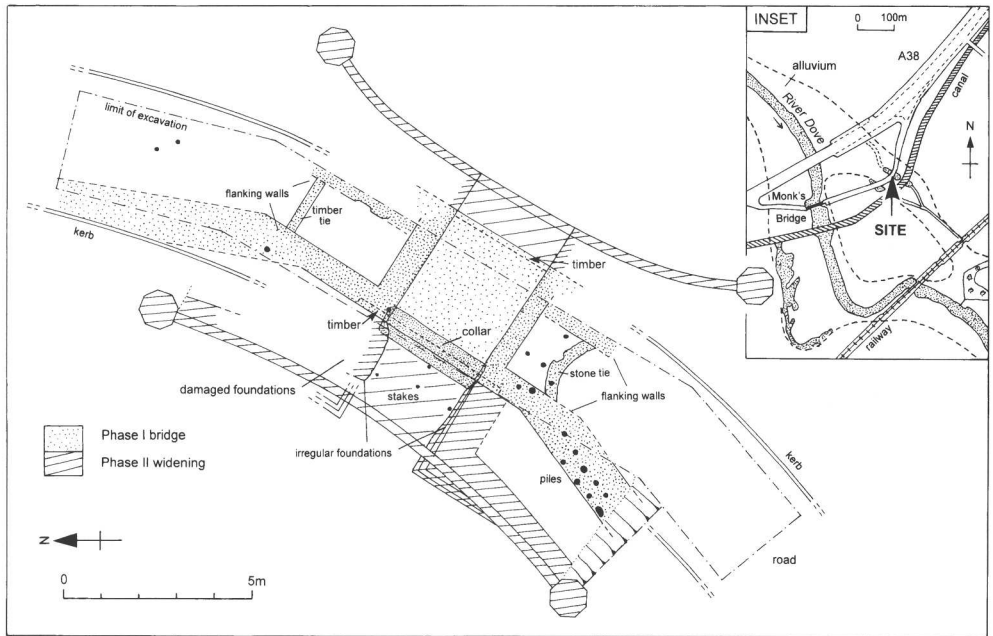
Monk's Flood North Bridge, Eggington: plan of bridge together with stonework and timbers revealed during repair-work of 2003; scale 1:200, with map inset at 1:20,000.
